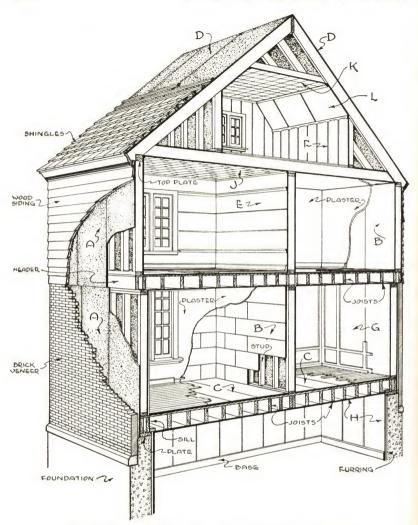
Section of Building Showing Typical Uses of Rigid Insulation
